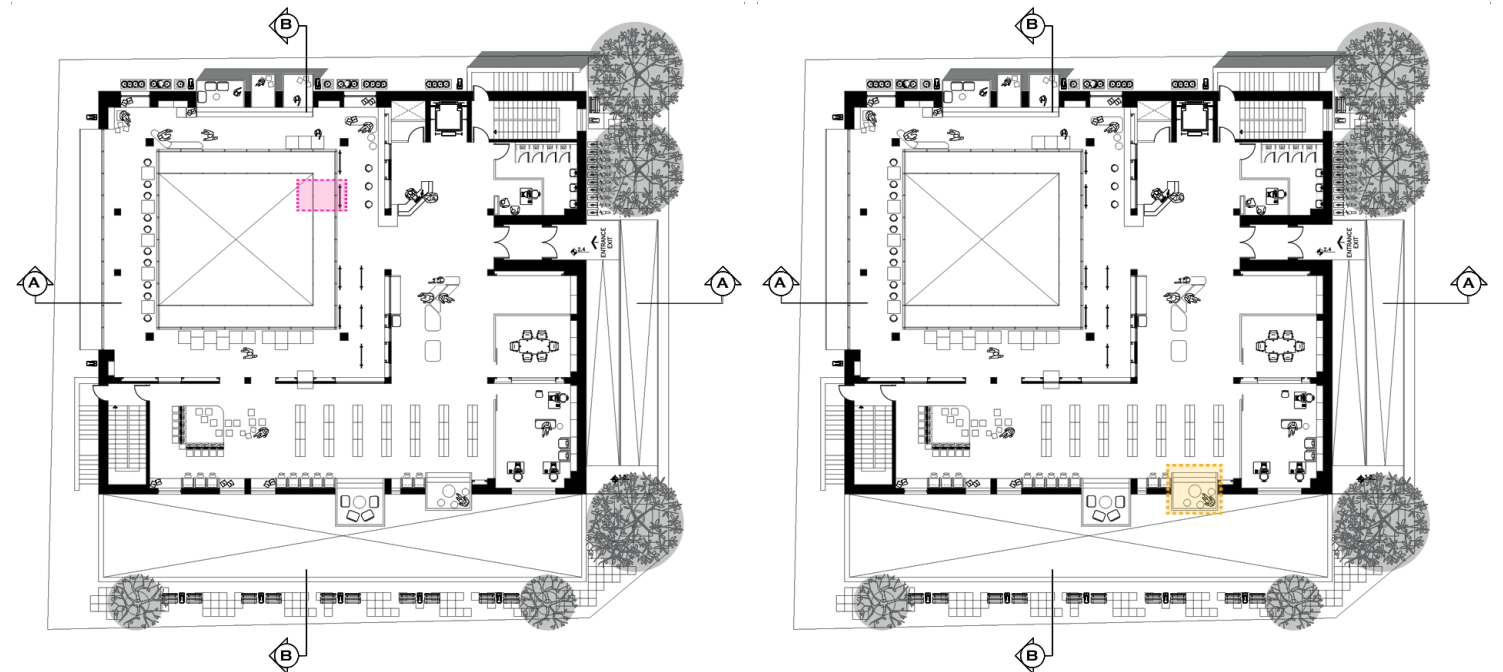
Location of Wall Section 2 on Ground Floor Plan
